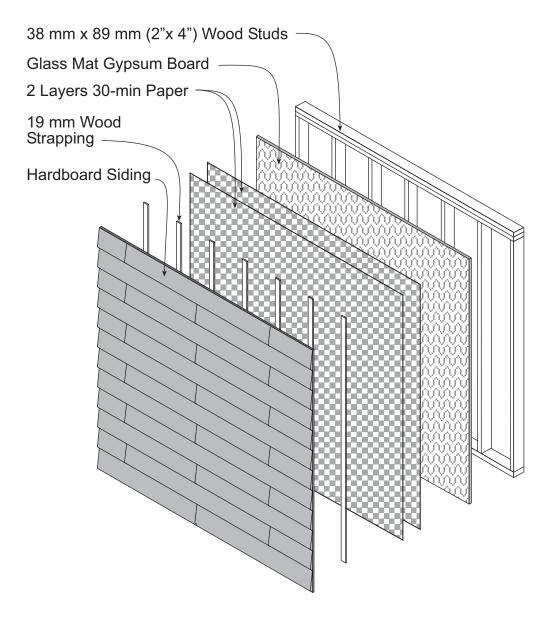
Composition of hardboard siding wall specimen No. 16
